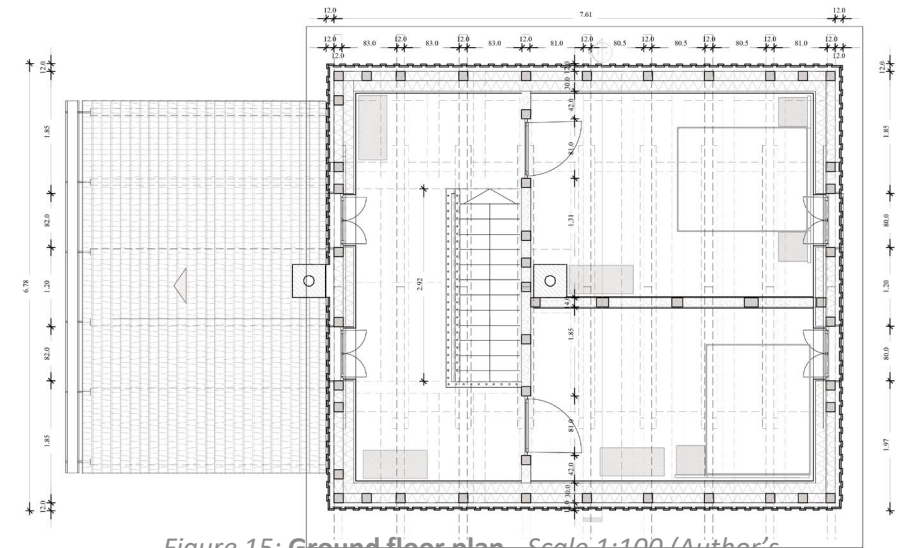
Ground floor plan - Scale 1:100 (Author's drawing)
